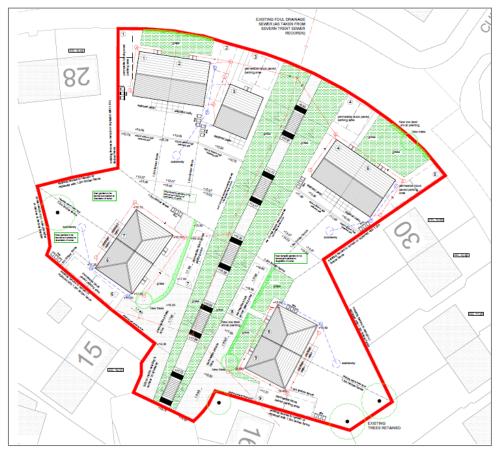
Extract from Proposed Site Layout Plan Ref 03.
